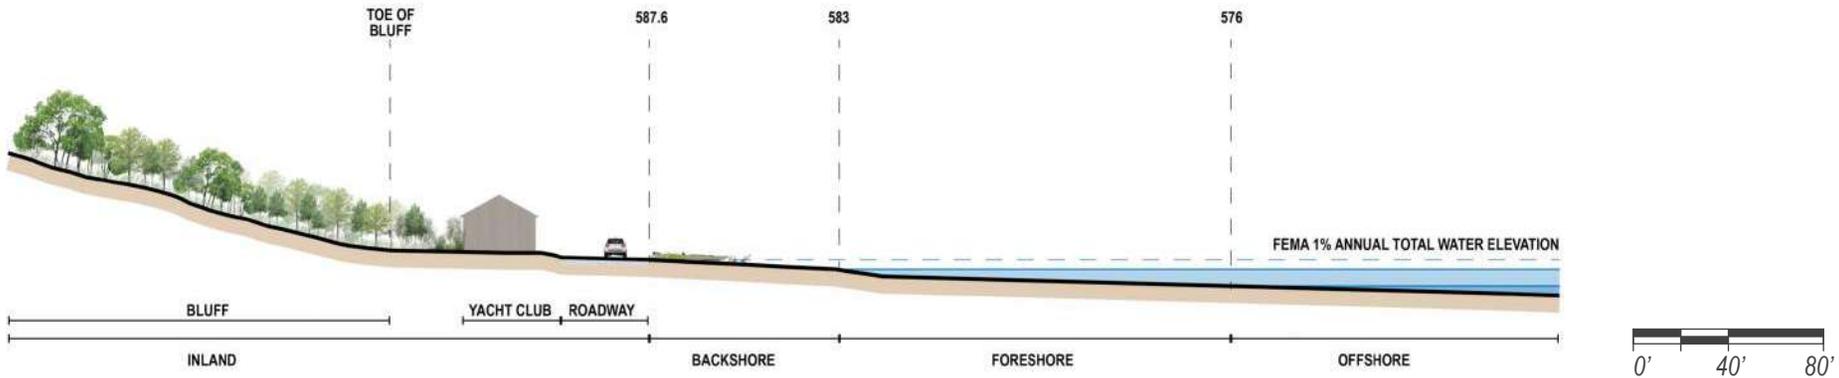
Cross Section of South Beach at Park Ave Boating Facility
